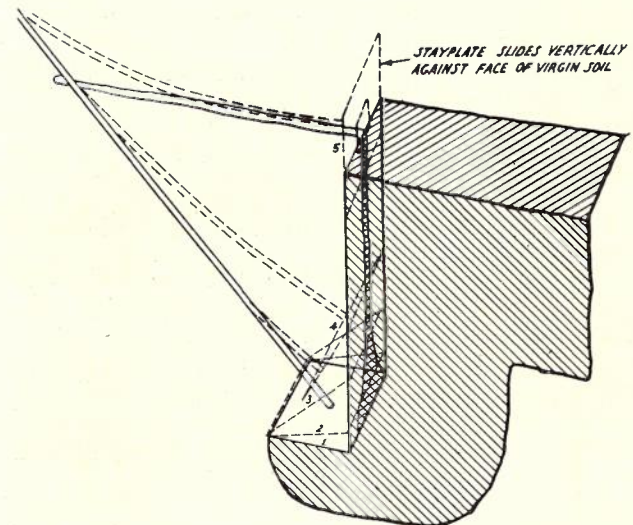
Behaviour of Stay Plate Under Excess Loading Conditions.
